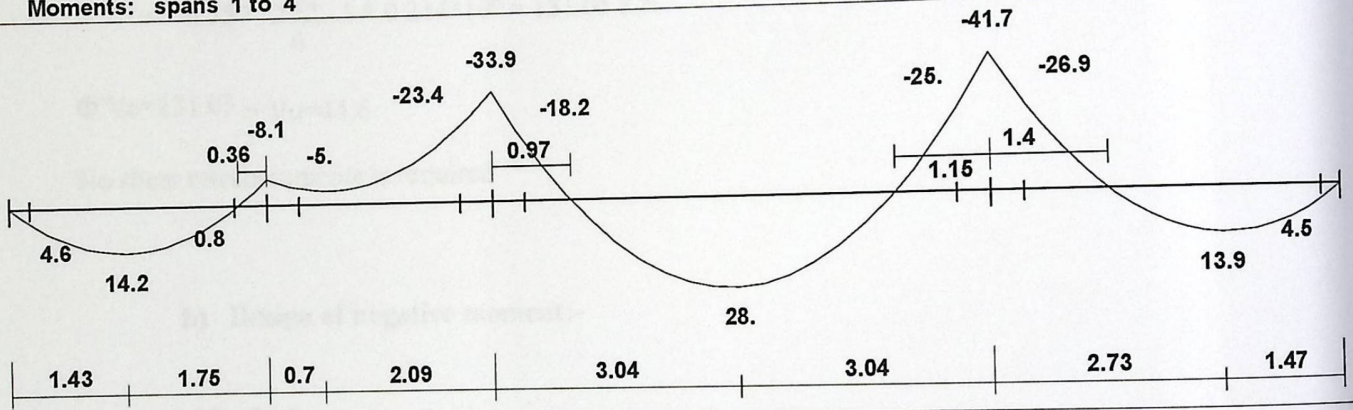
Envelope moment Diagram of Solid Slab (S1).
